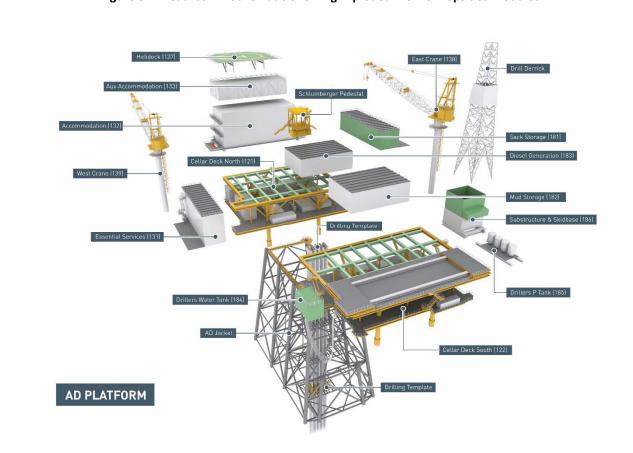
Beatrice AD Schematic Showing Exploded View of Topsides Modules
